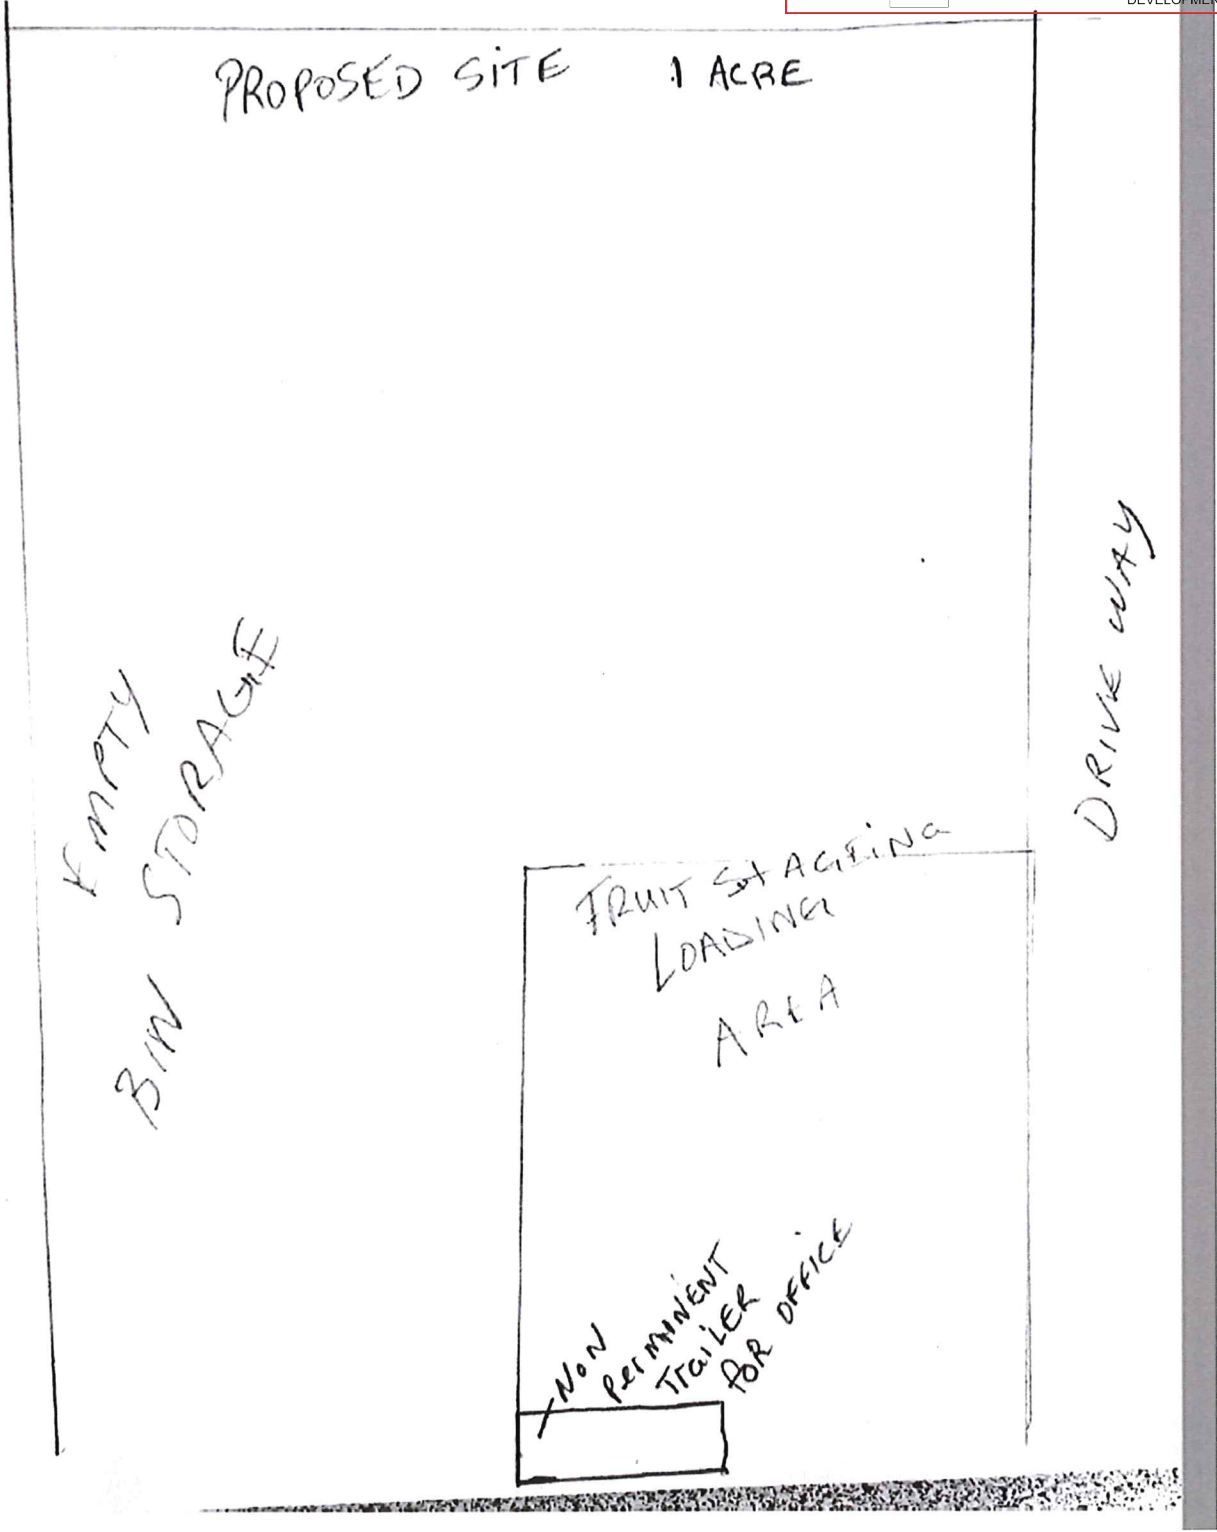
; Site map produced by project proponent showing specific layout of scale shack, loading area and bin storage.
